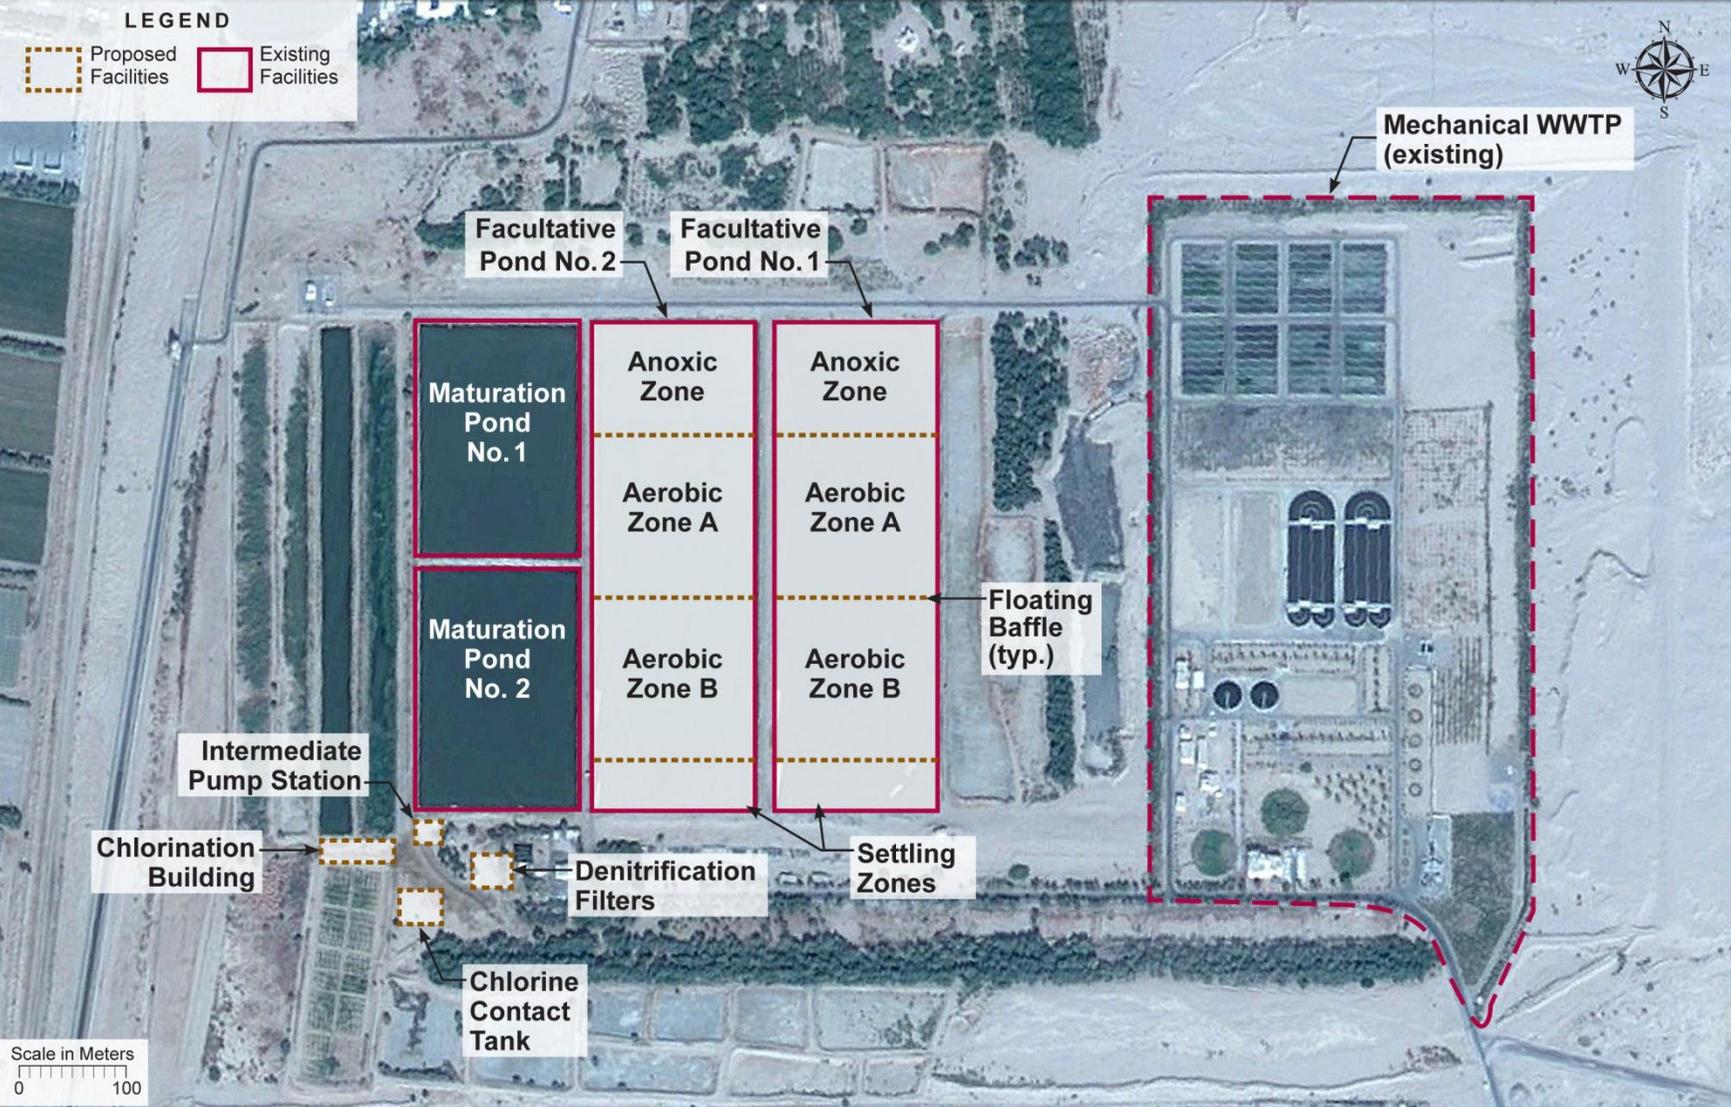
Natural WWTP Option 1 Proposed Layout Modify Existing Facultative Ponds
